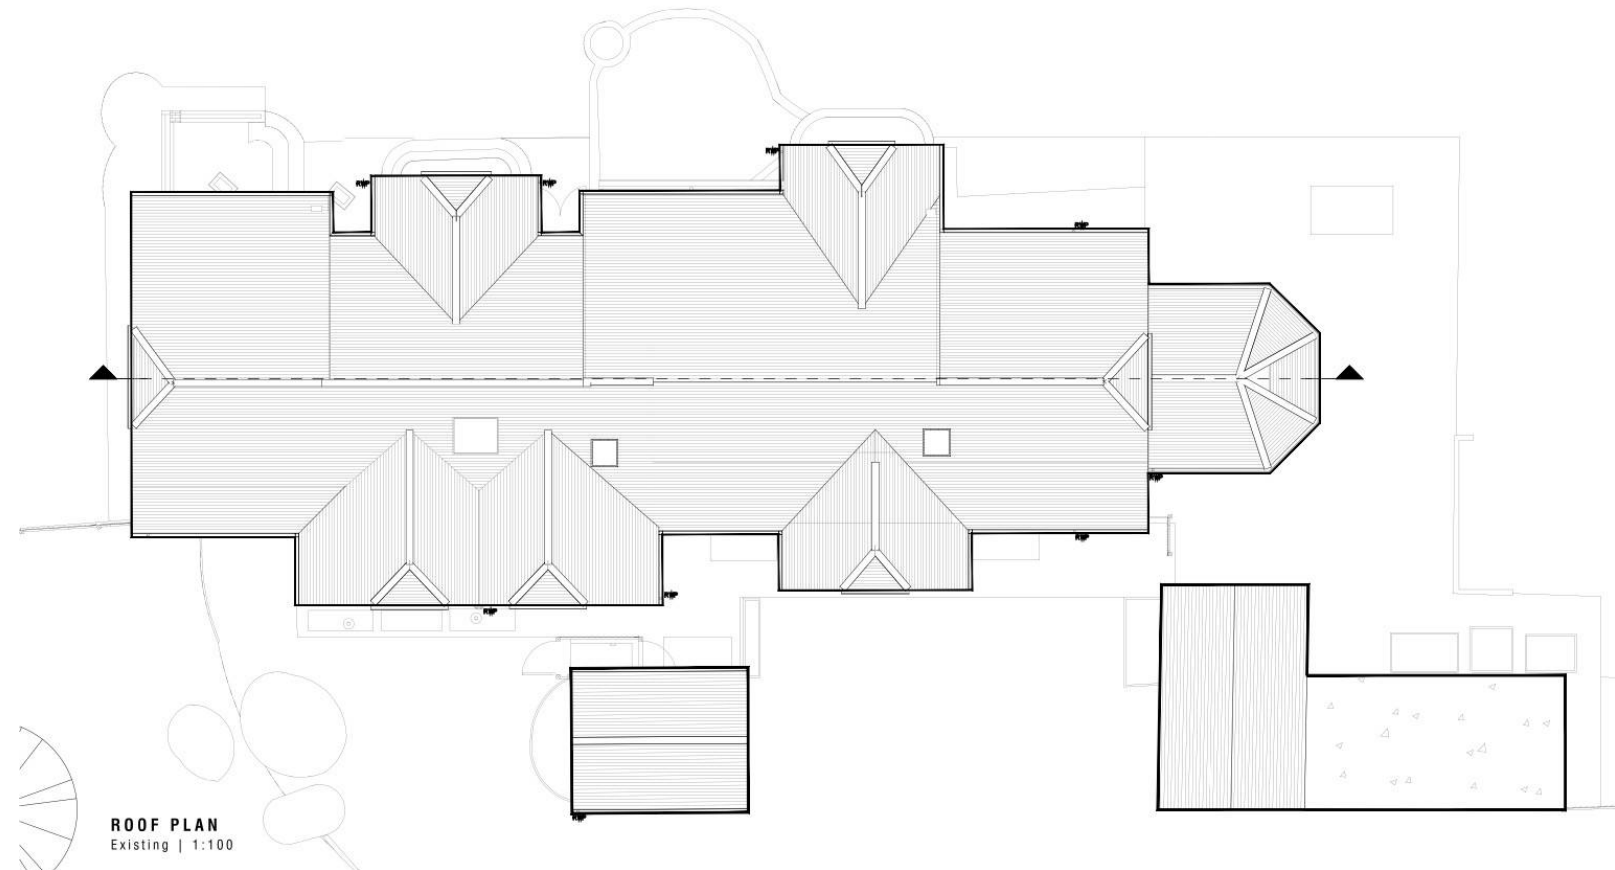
DRAWING 2410 101 and 102 EXISTING PLANS AND ELEVATIONS (EXTRACT)
